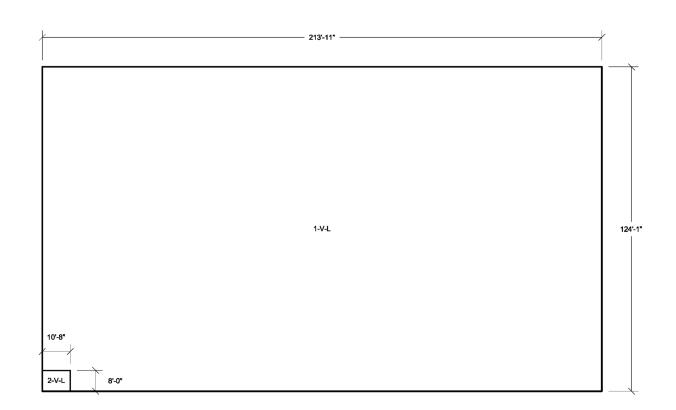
H.3-39 Elevation 95 Looking Down North-South Reinforcement Zones Near Side Face
